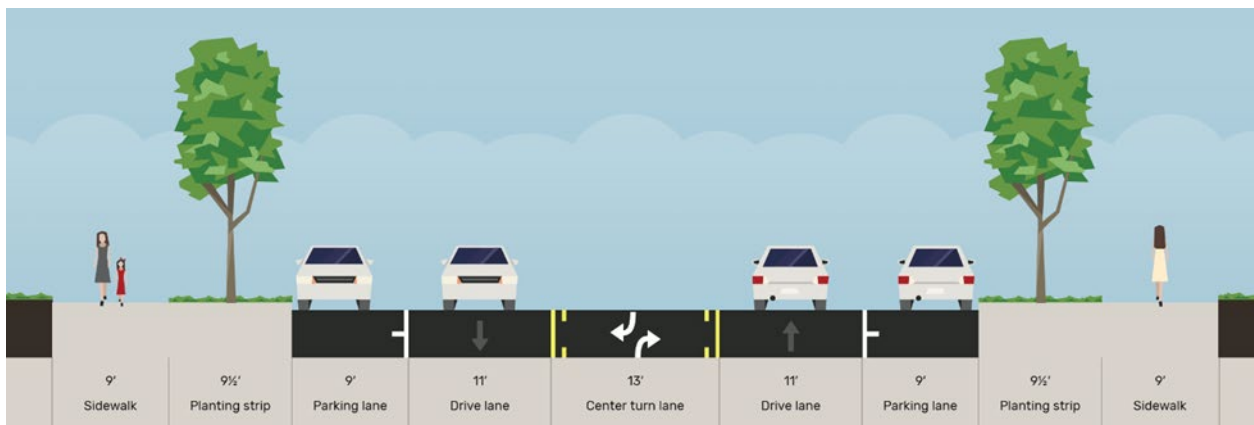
Cross section diagram of design recommendations with on-street parking and no bike lanes (assuming 90’ from outside of sidewalk to outside of sidewalk).
